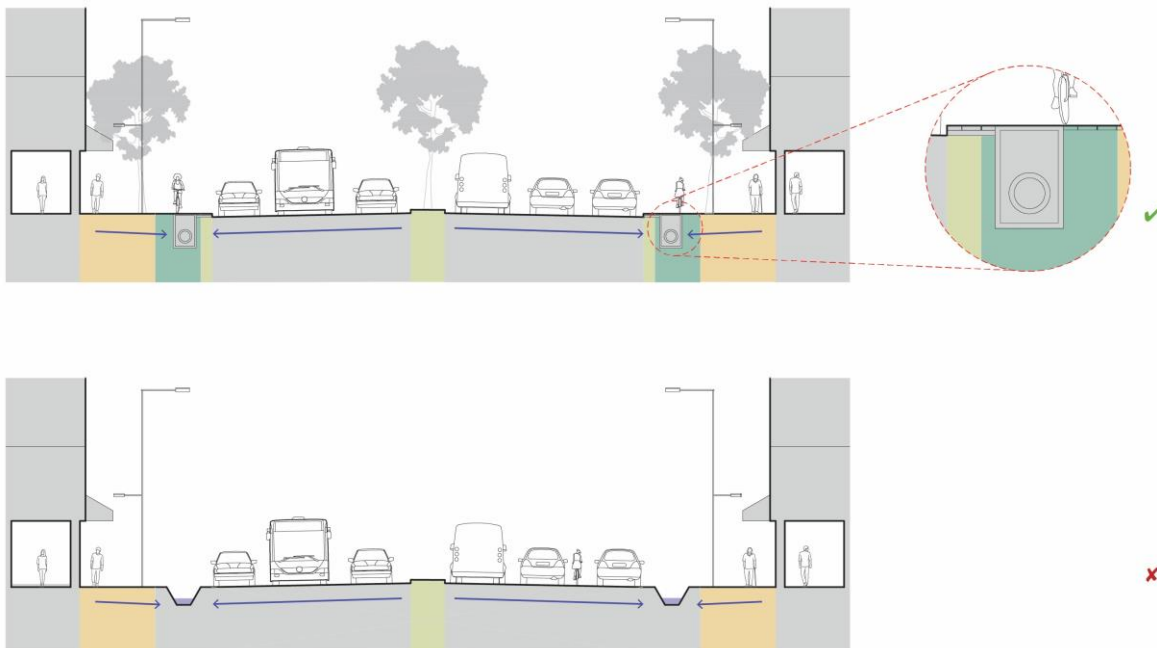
On collector and arterial streets, stormwater should be carried underground to free up space for cycle tracks, wider footpaths, trees, and street furniture.
